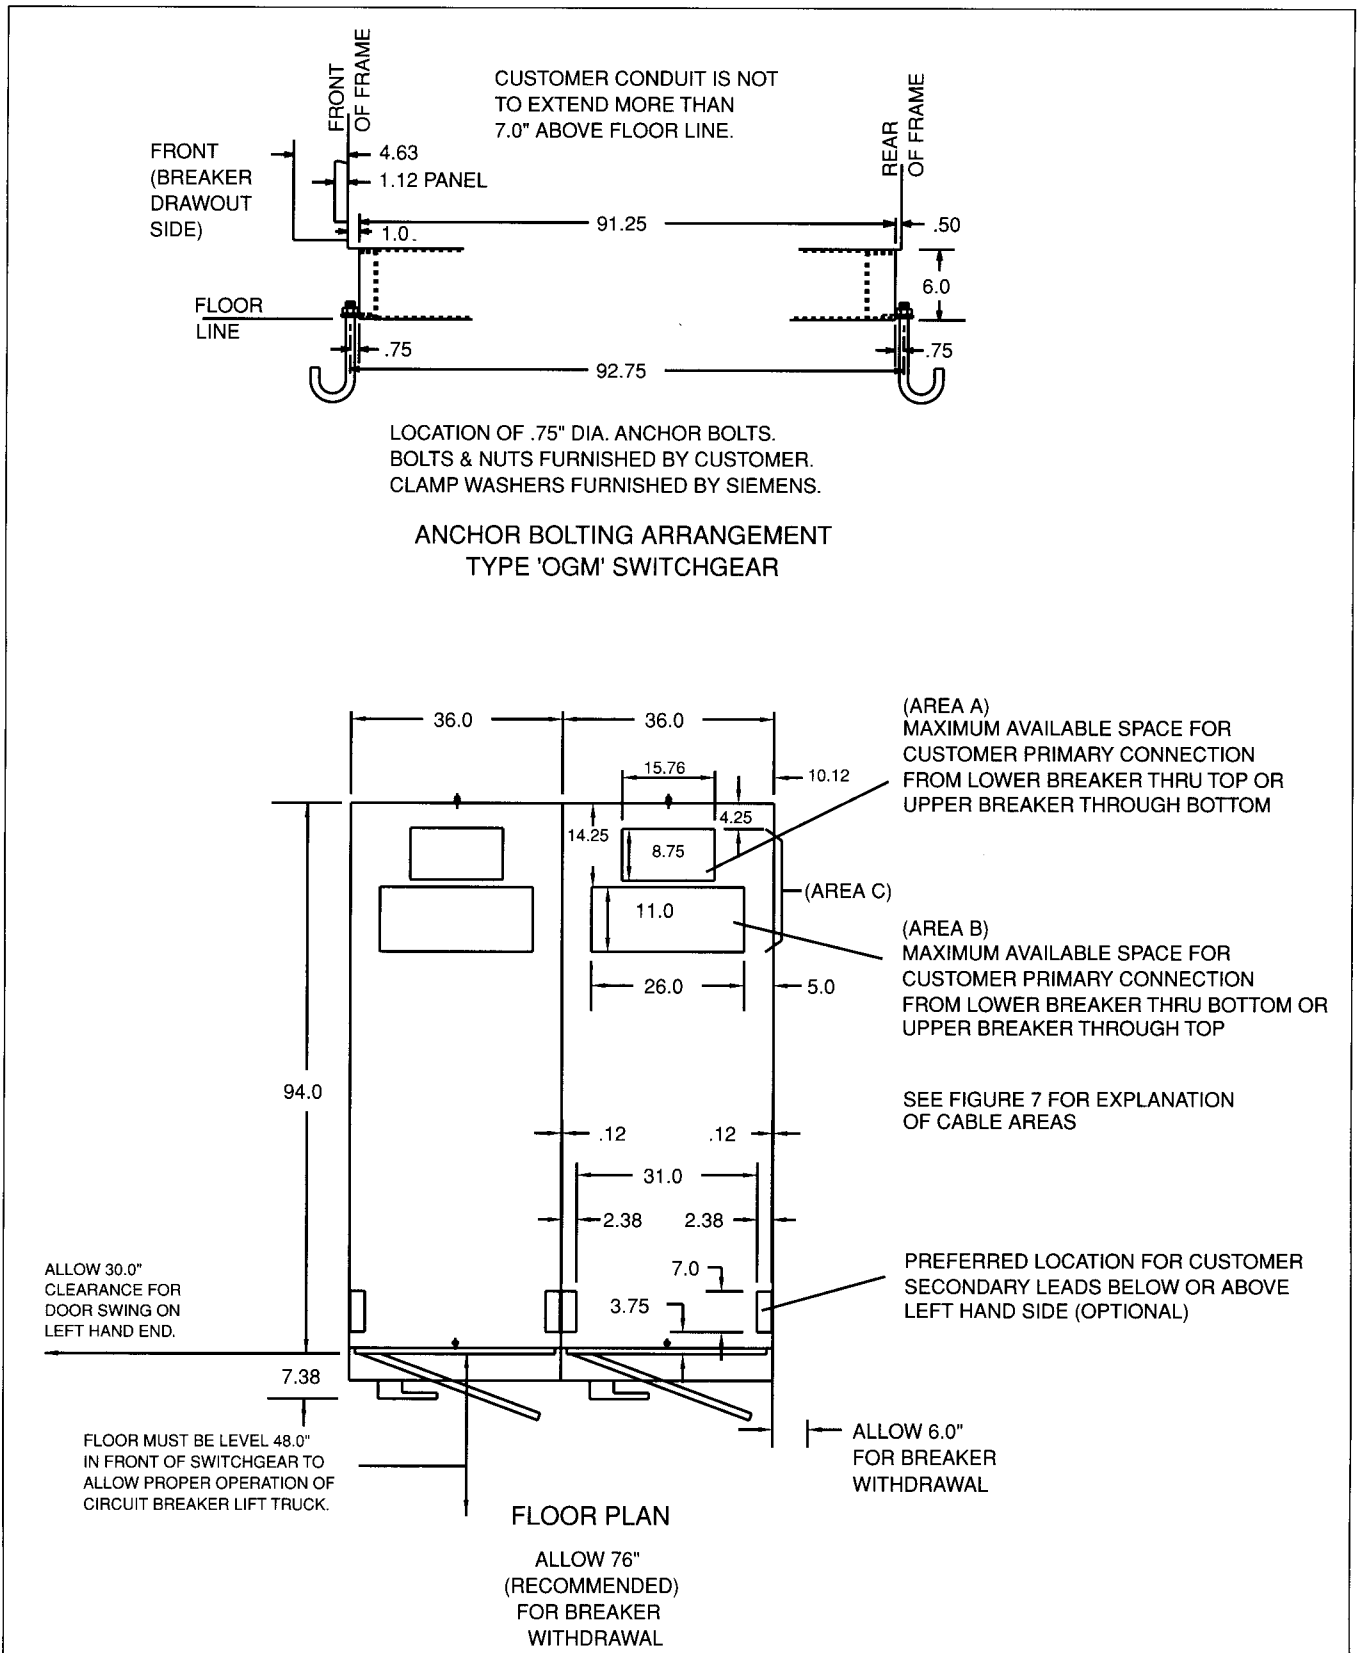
Anchoring Outdoor OGM Non-Walk-In Switchgear
